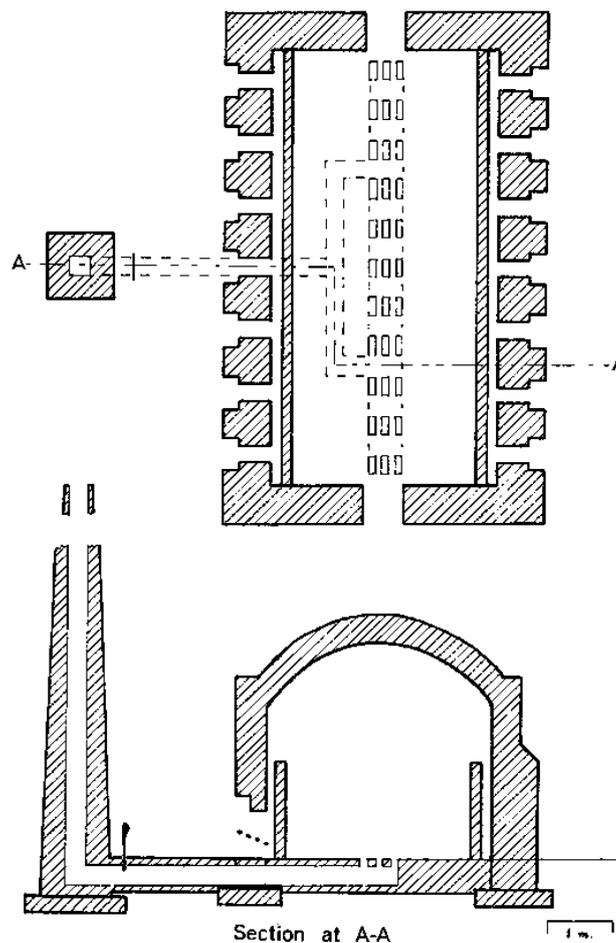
Sketch of a down-draught kiln [ILO, 1984]
